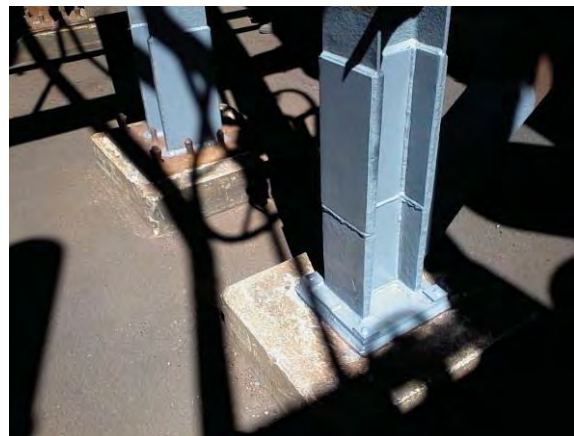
Recent repairs to infrastructure supporting walkways at 352 Tailings Still Area
